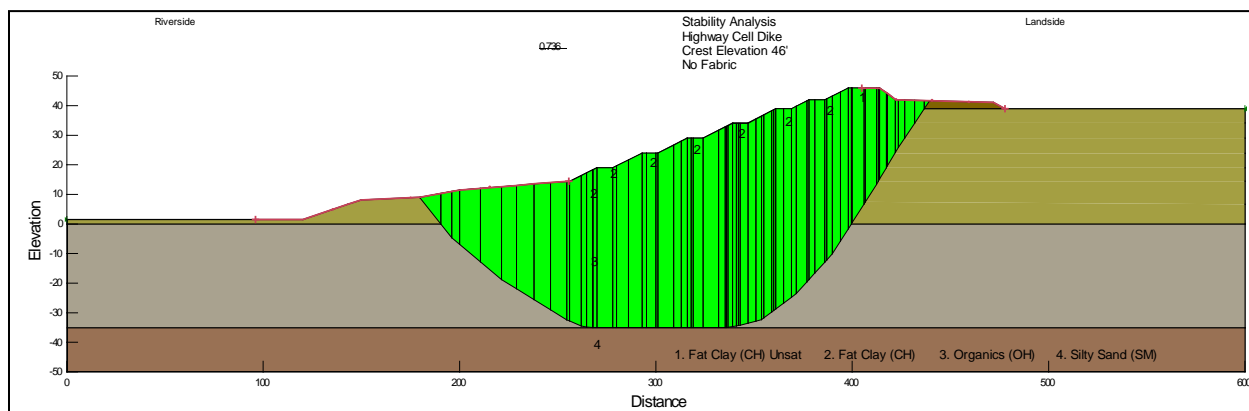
Highway Cell. Elevation 50'. No Geotextile. FS = 0.736
